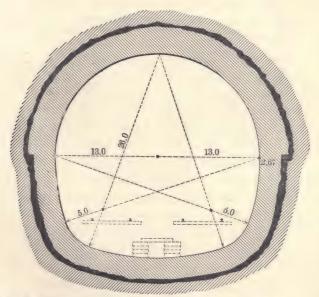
HOOSAC TUNNEL SECTION THROUGH SOFT GROUND.
